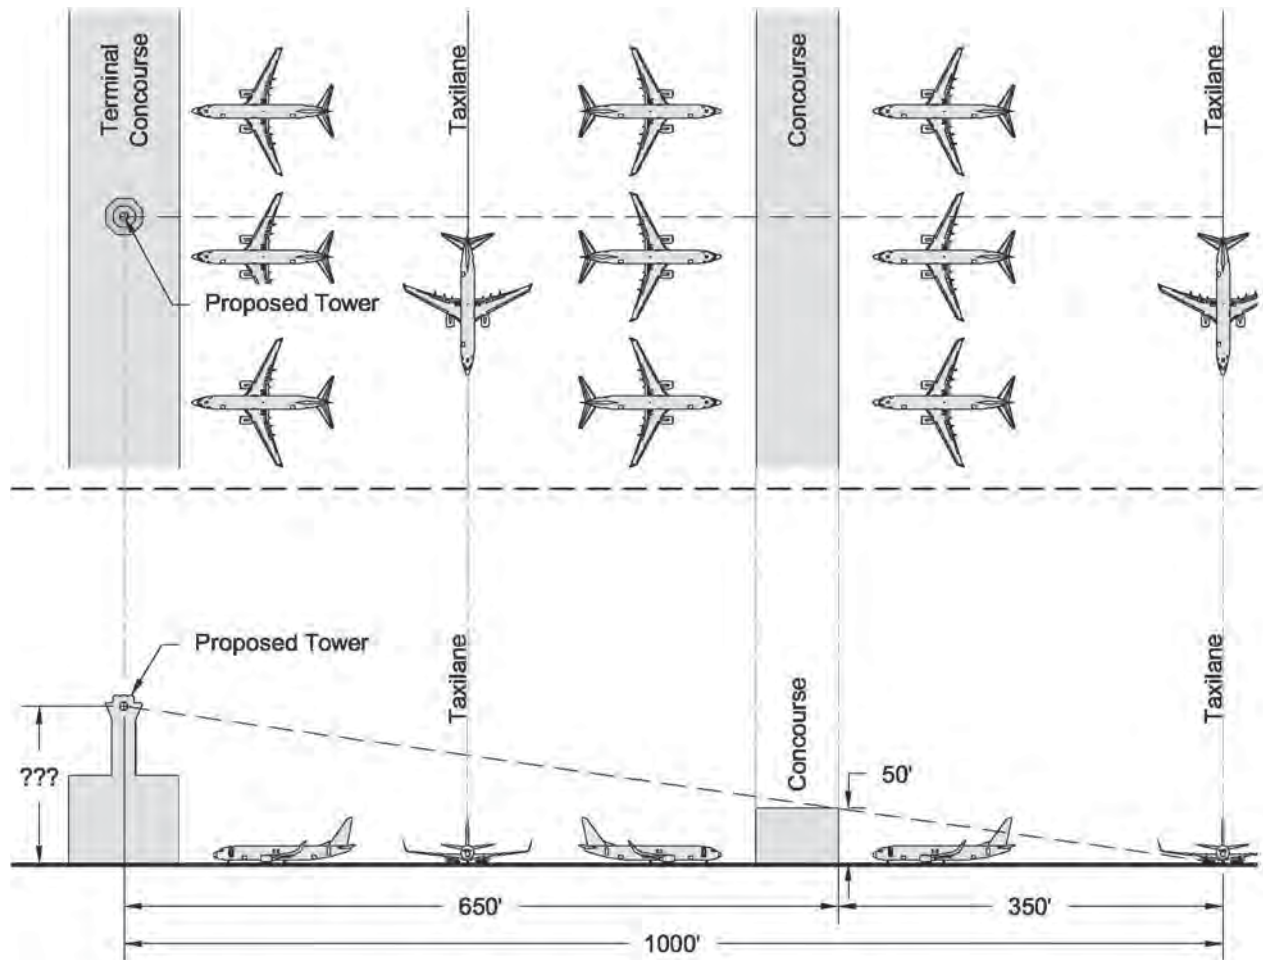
Ramp tower planning example – determining apron visibility from existing tower.
